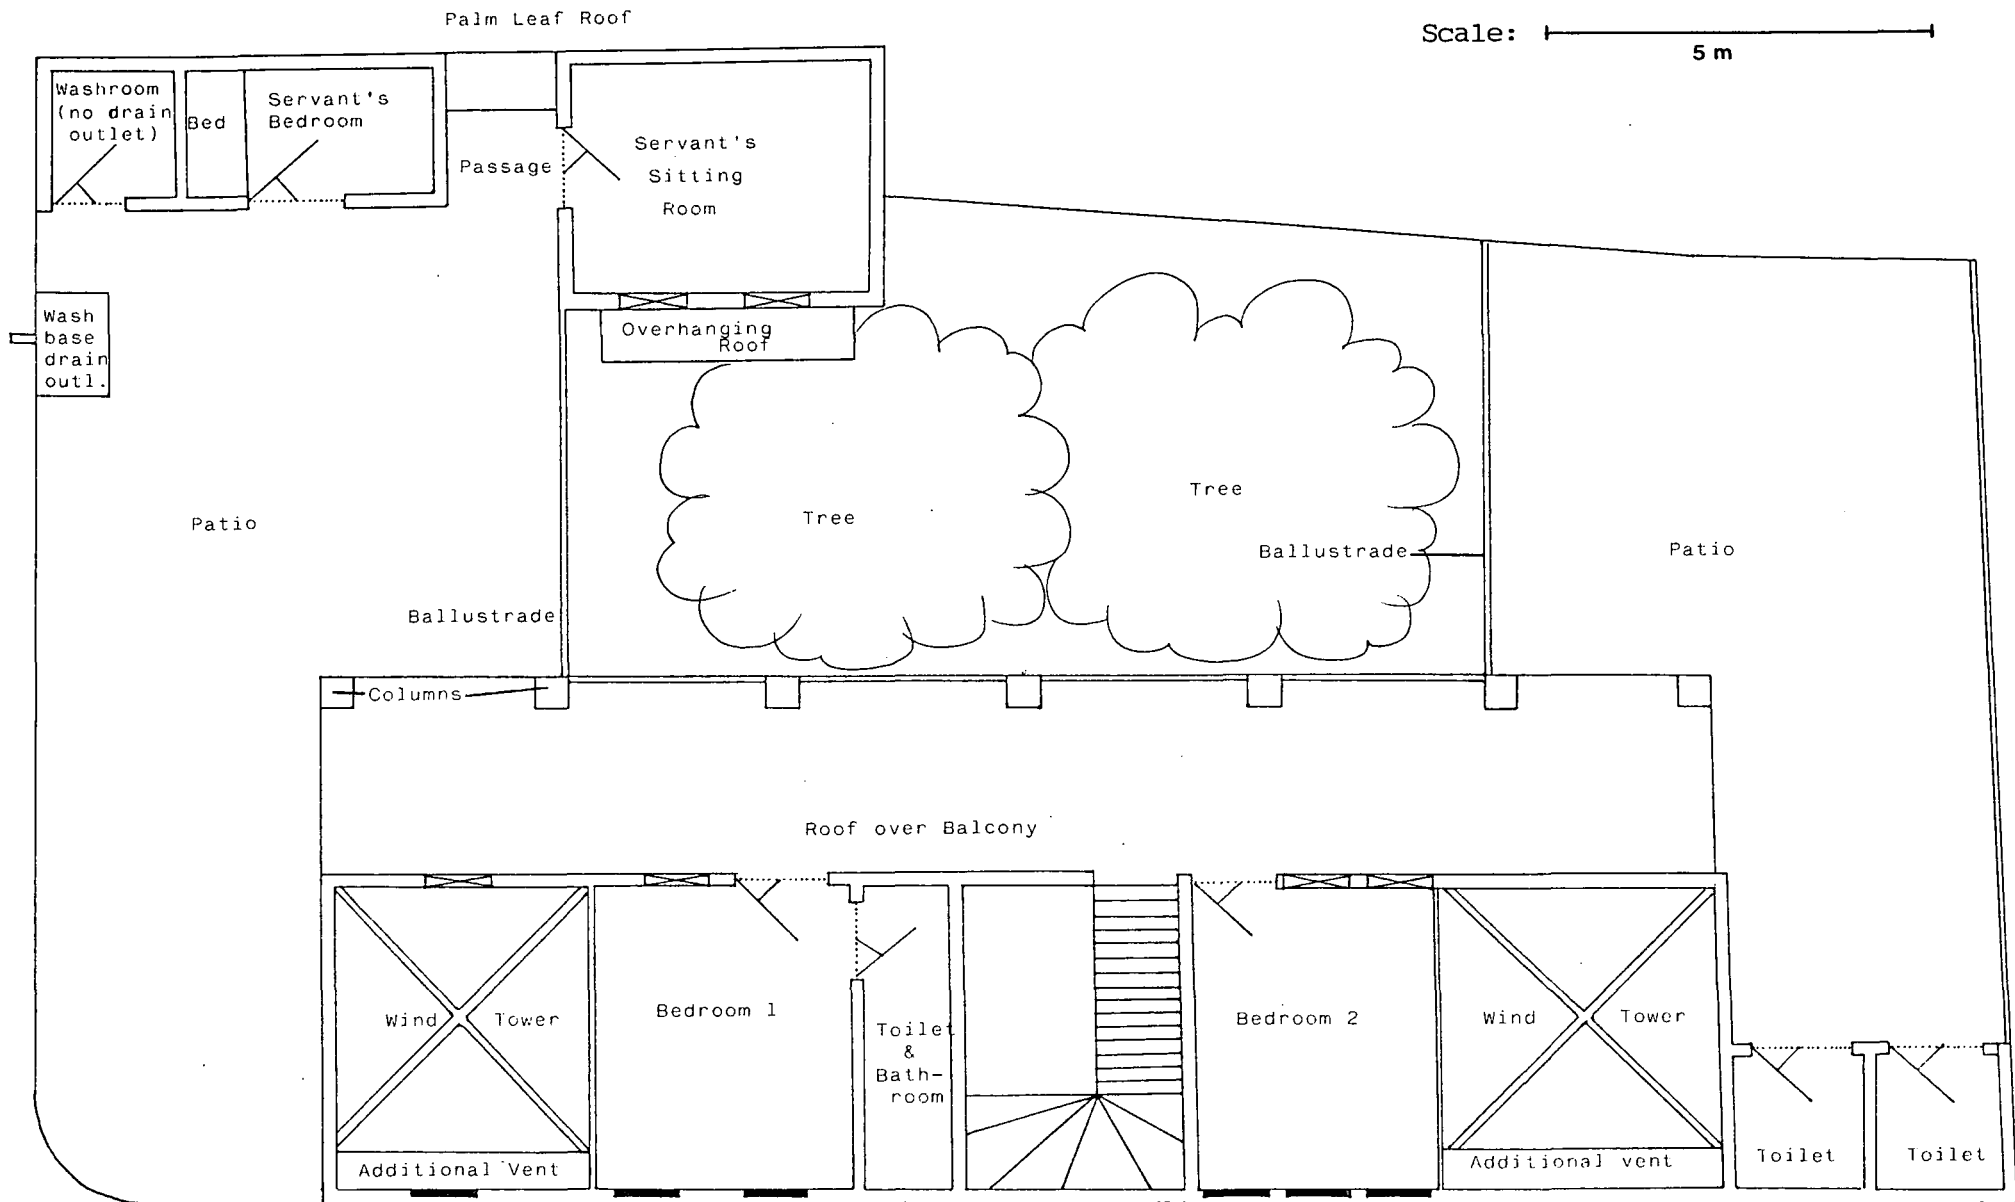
ZAROUNI HOUSE: GROUND FLOOR PLAN
